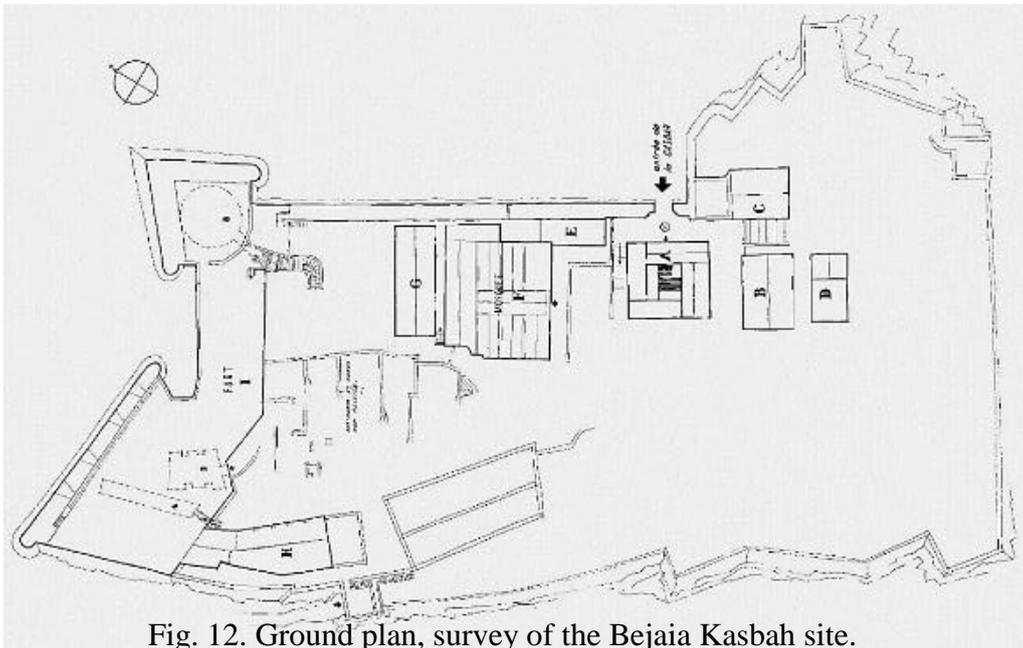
Ground plan, survey of the Bejaia Kasbah site.
